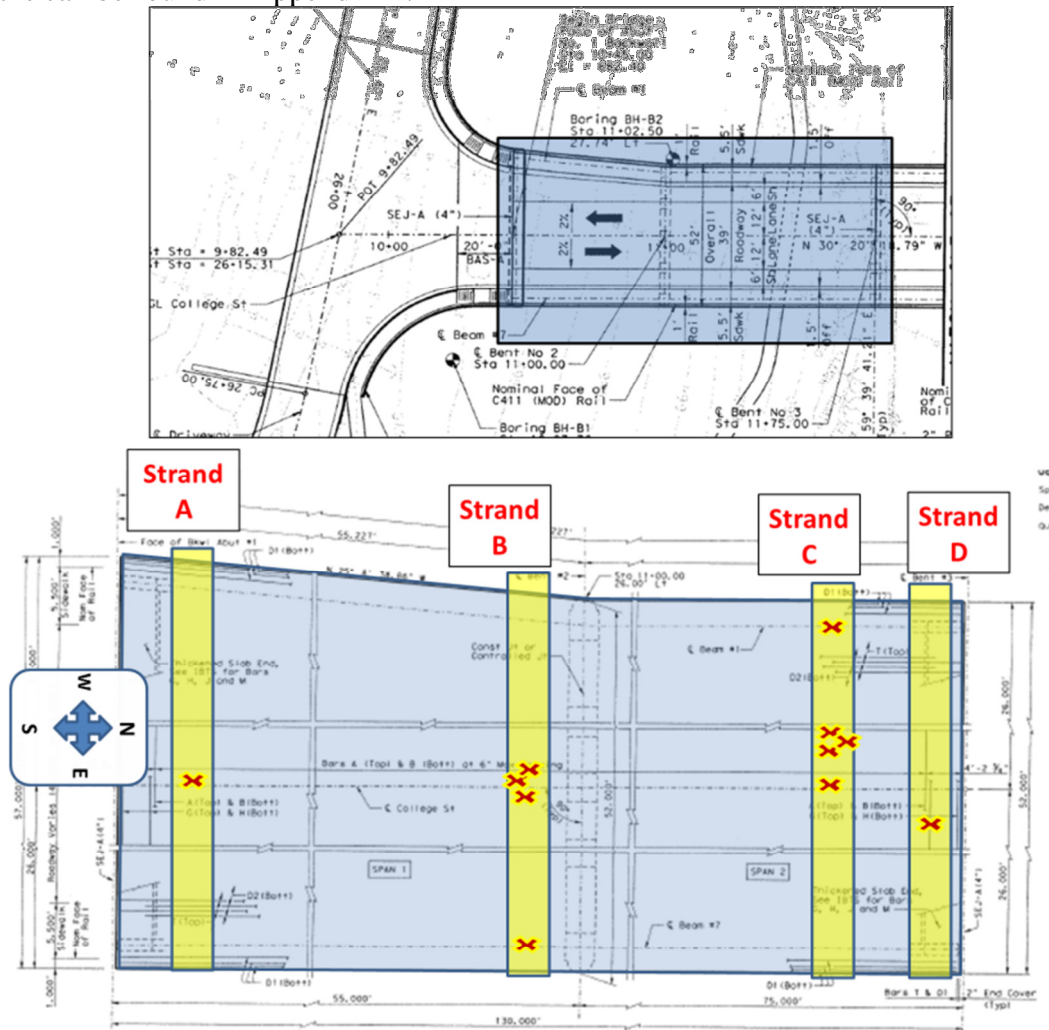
iButton string layout for Georgetown bridge deck summer pour.
